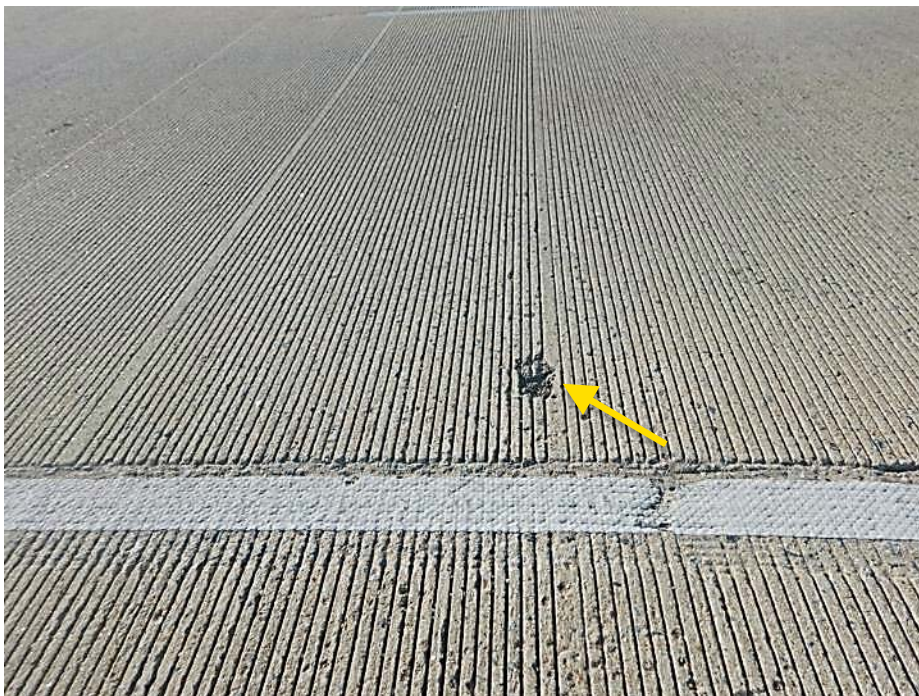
NCB-SB Span 12 Concrete Deck – Surface Spall, No Exposed Reinforcement (Looking East)
